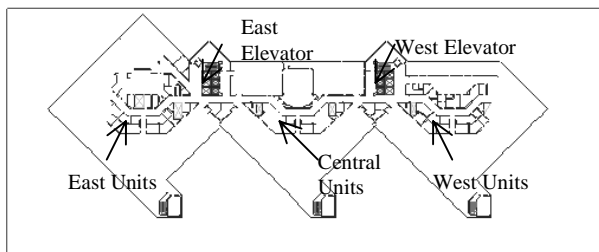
Generic Floor Plan for the 3rd-8th Floors
